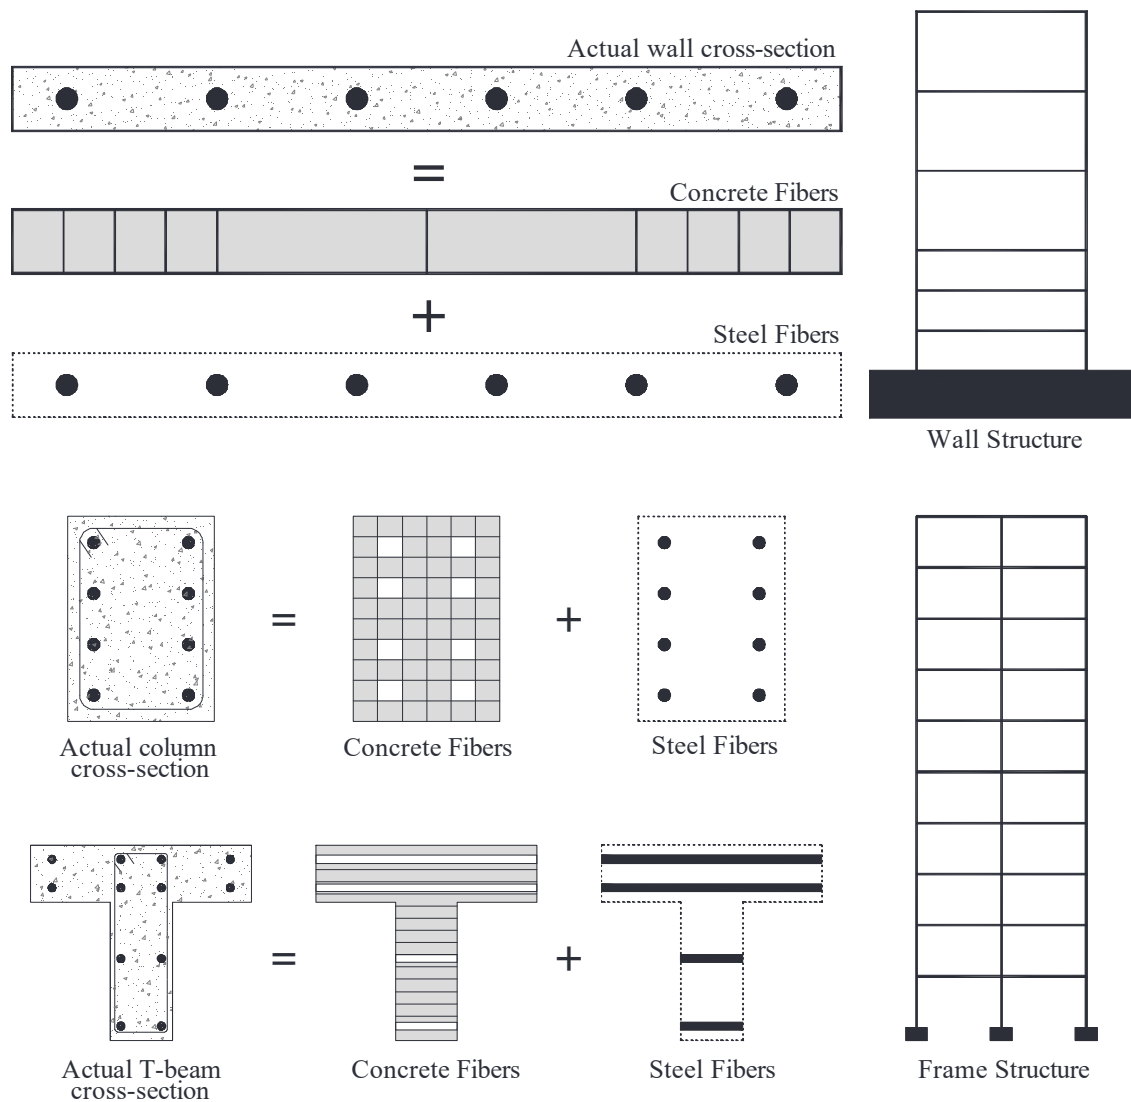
PERFORM-3D: Modelling approach of RC cross-sections
